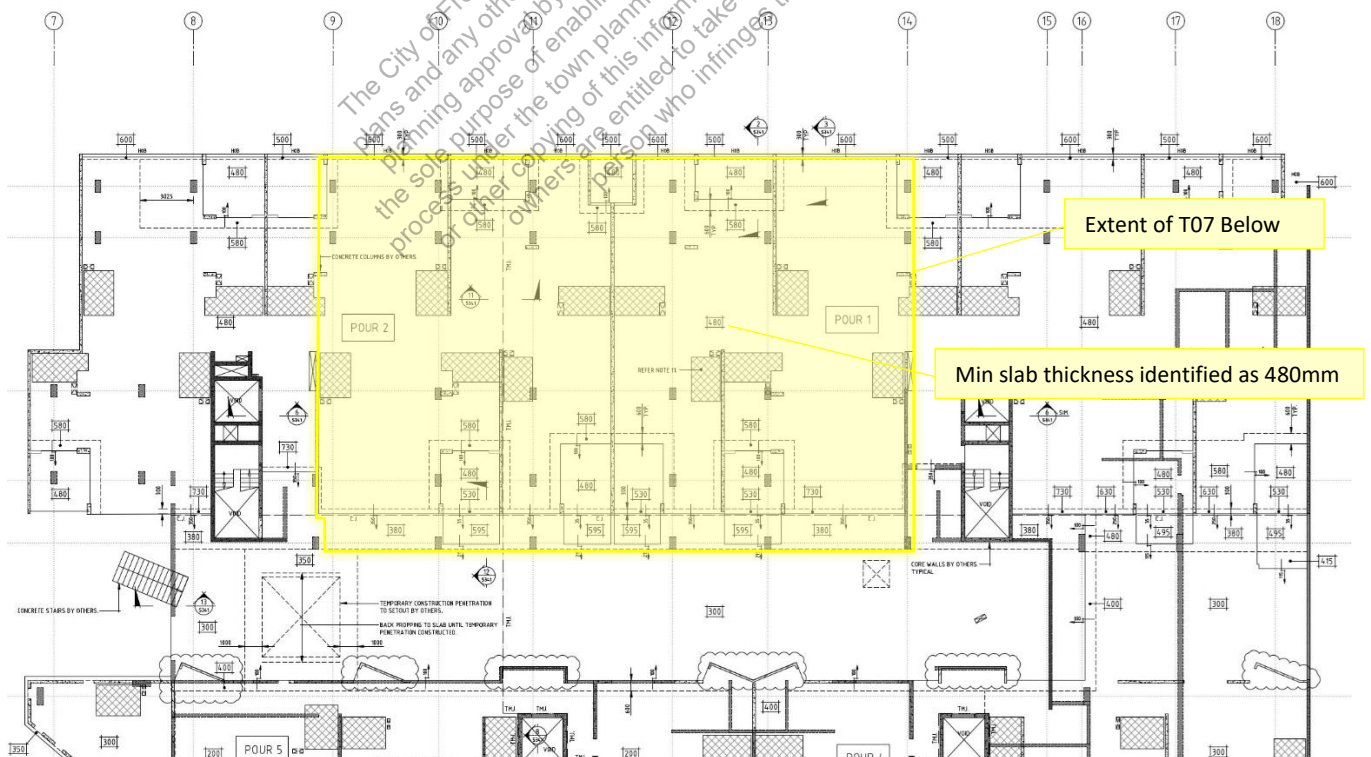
Extract from S302 Rev E Level 1 GA PLAN ZONE 2 dated 09.05.17: First Floor Slab Thicknesses
